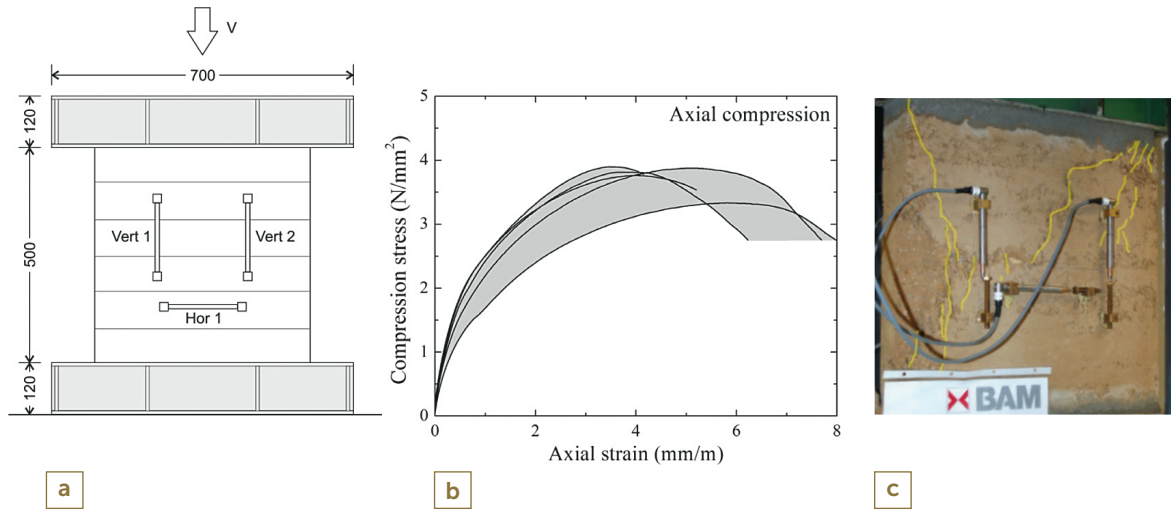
Compression tests: (a) test setup (dimensions in mm); (b) compression stress–axial strain curves and respective envelope; (c) crack pattern of one of the rammed earth wallet.
